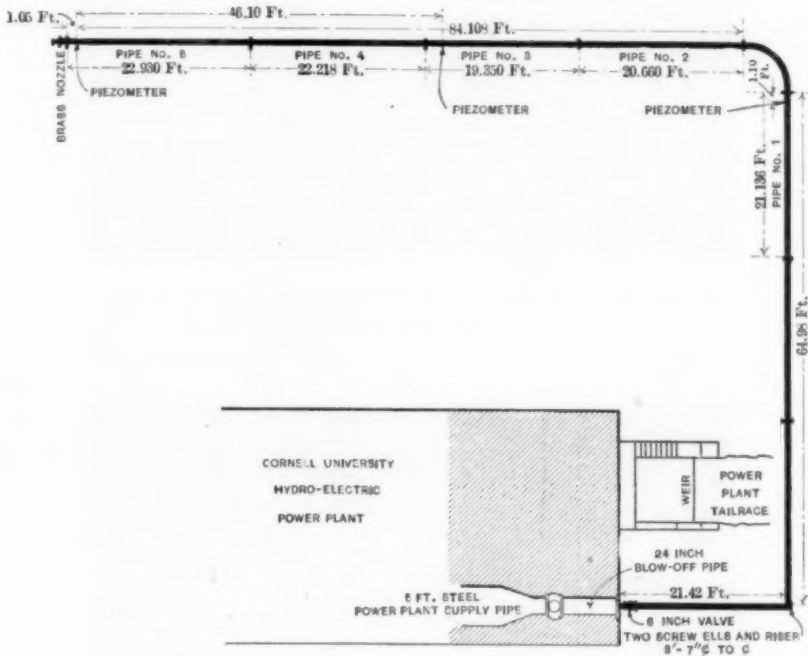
PLAN OF SIX-INCH WROUGHT IRON PIPE LINE
